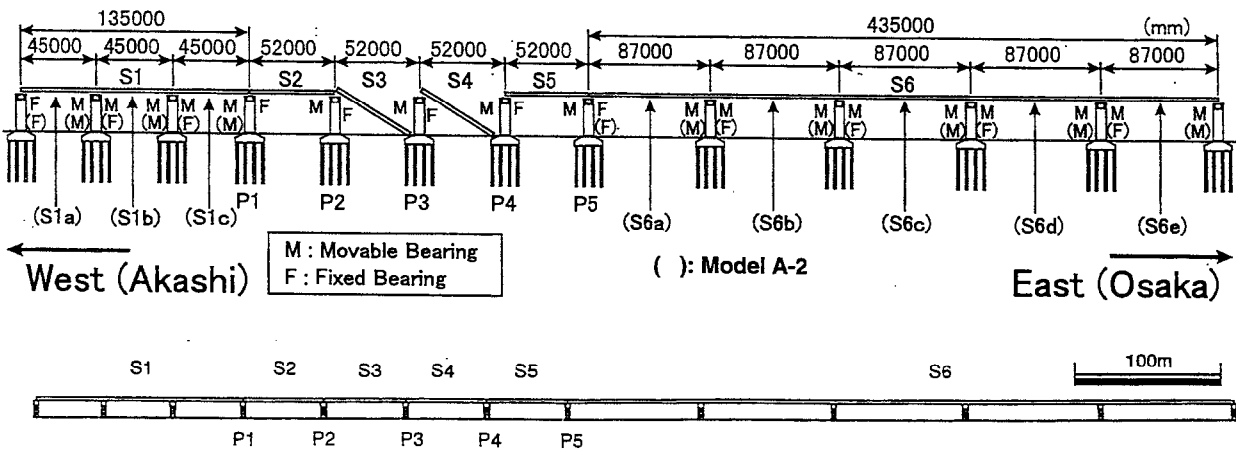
Overview of the objective damaged bridges and simulation model (Model A)
